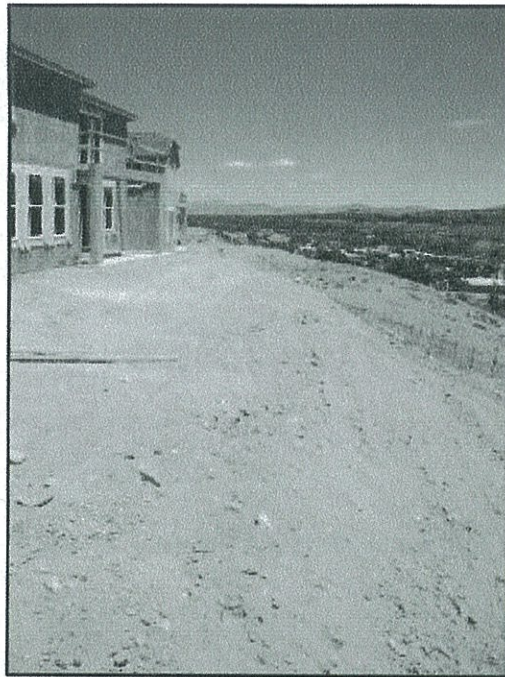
View looking east of the Bella Rio construction project of the same slope in photo 20.
